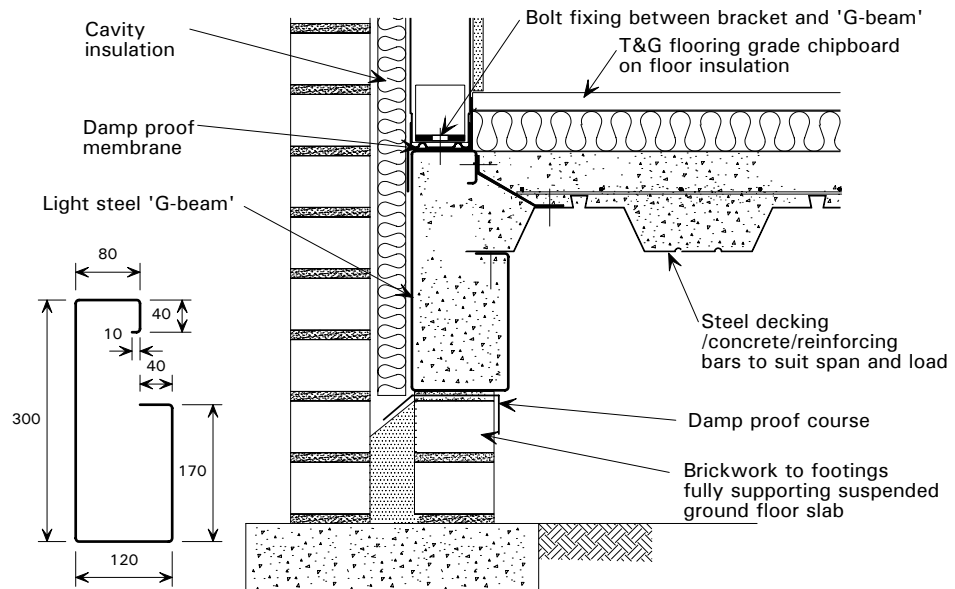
Suspended ground-floor system with light steel 'edge-beam' as used for the Oxford Brookes demonstration building
